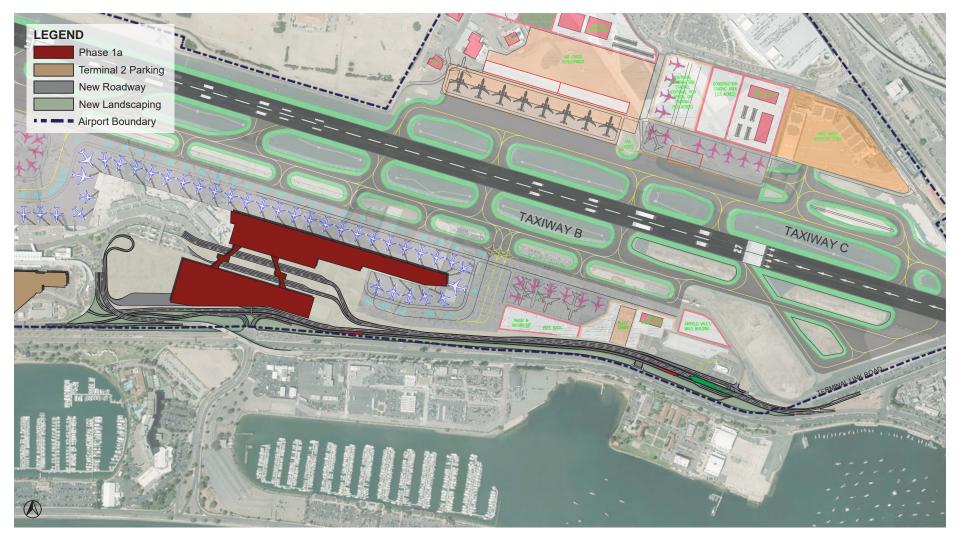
Proposed On-Airport Entry Roadway Concept
